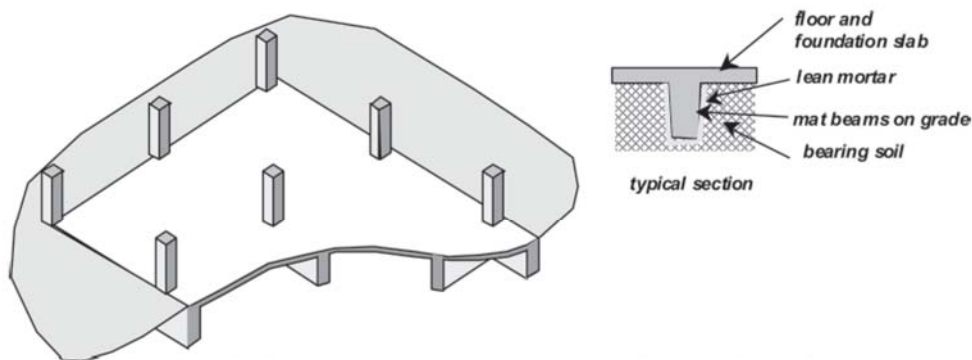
Foundation mat with grade beams under the slab.
